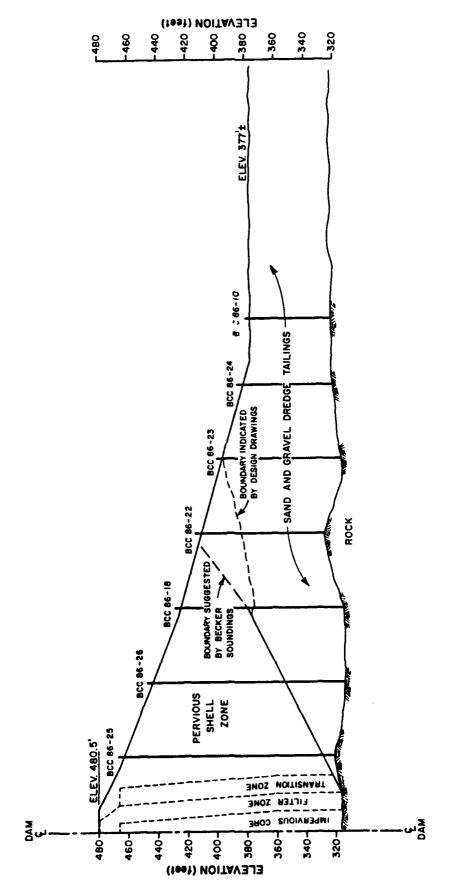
CROSS SECTION OF MORMON ISLAND AUXILIARY DAM AT STATION 449+90
